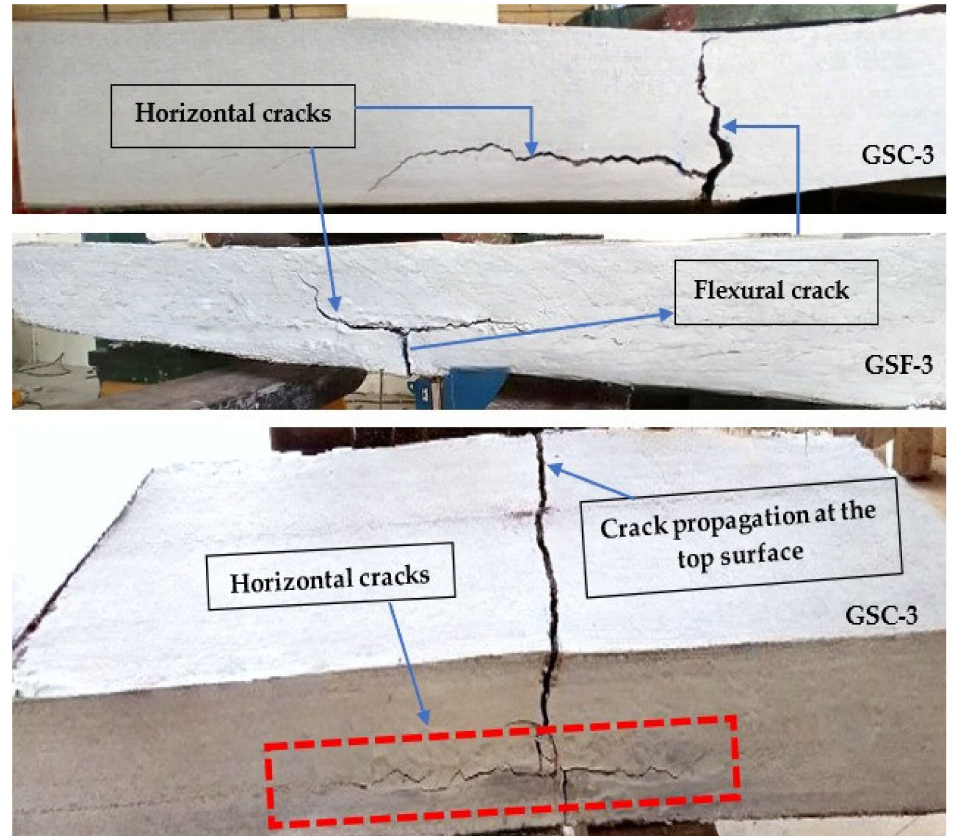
Crack propagation and failure mode of Mode-III slab specimen.
